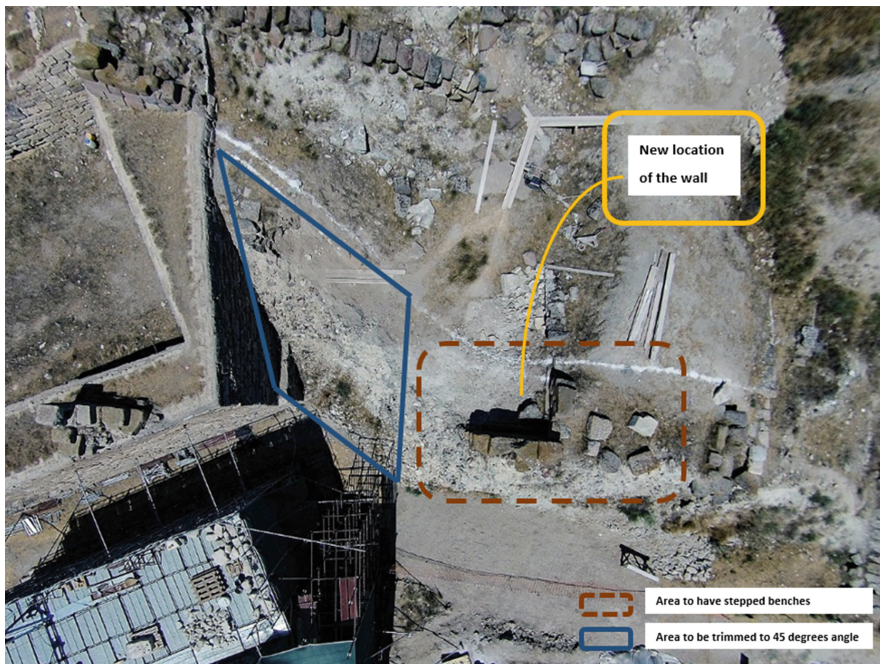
Aerial photo summarizing the stabilization works mentioned
